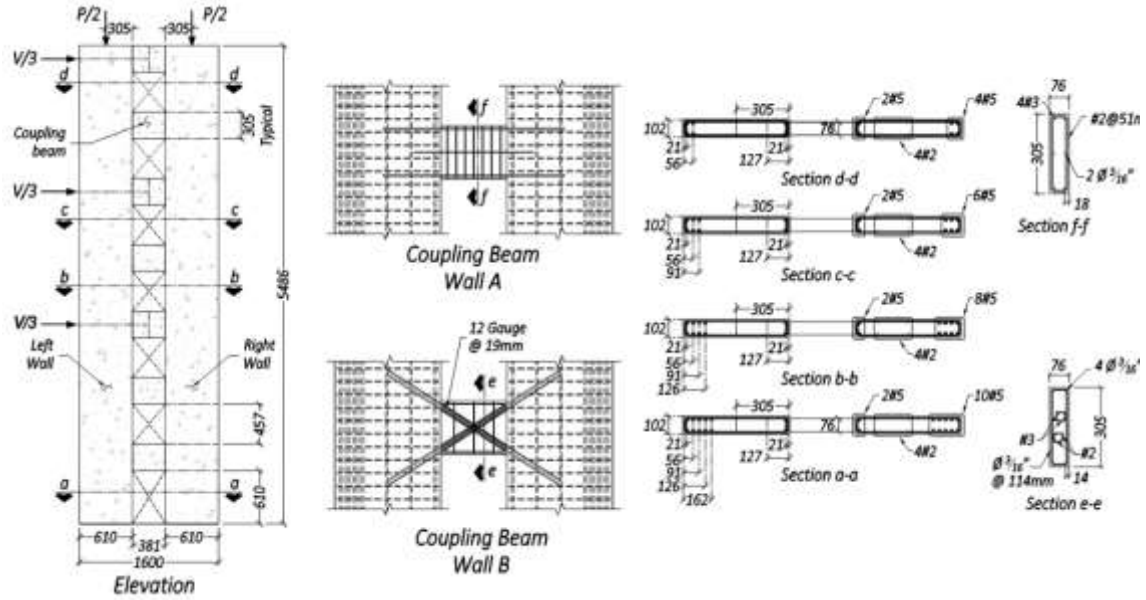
Geometry and reinforcement details of specimens Wall A and B.
